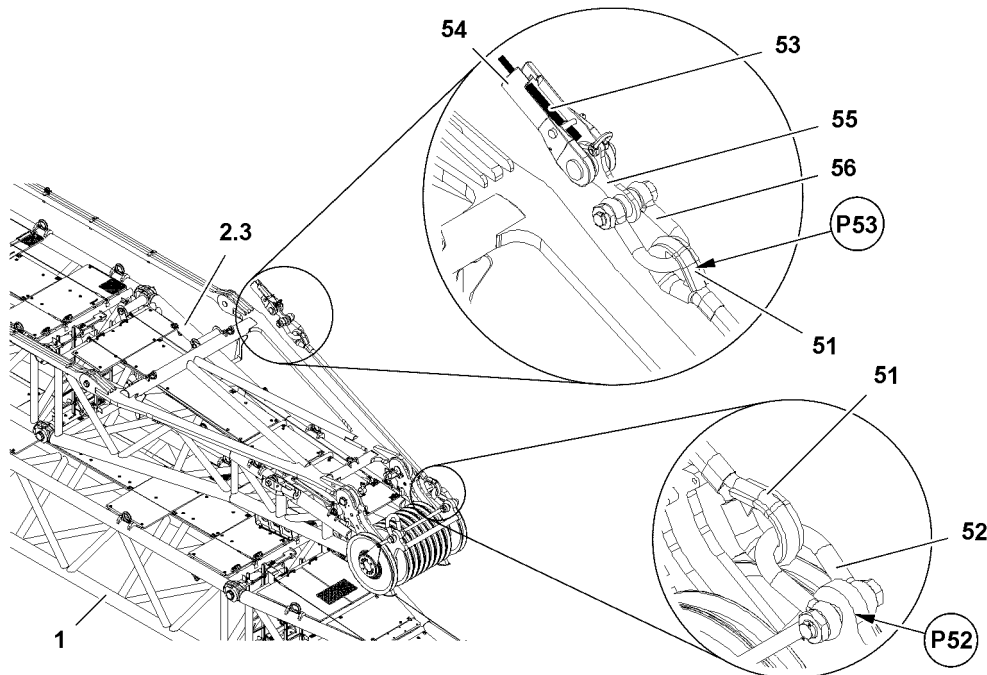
Erecting the WA-frames — Connecting the hoist rope with WA-frame 2
